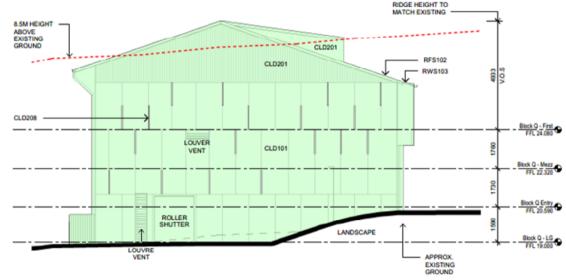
Building Q – West Elevation (Source: NBRS Architecture, Dated 26/02/2019)
